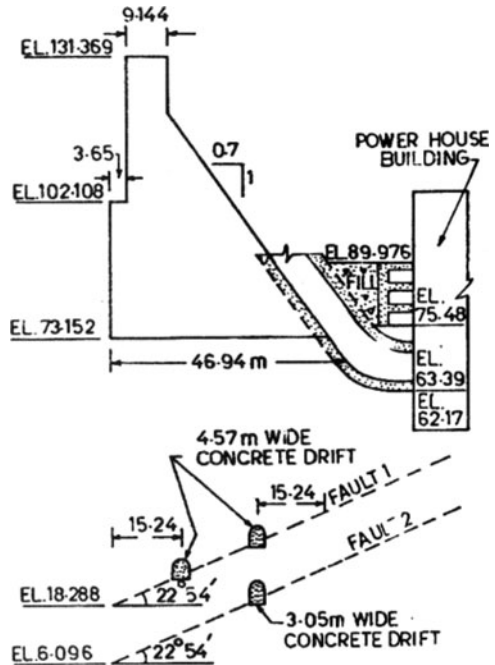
Rana Pratap Sagar dam section showing cable anchors.
